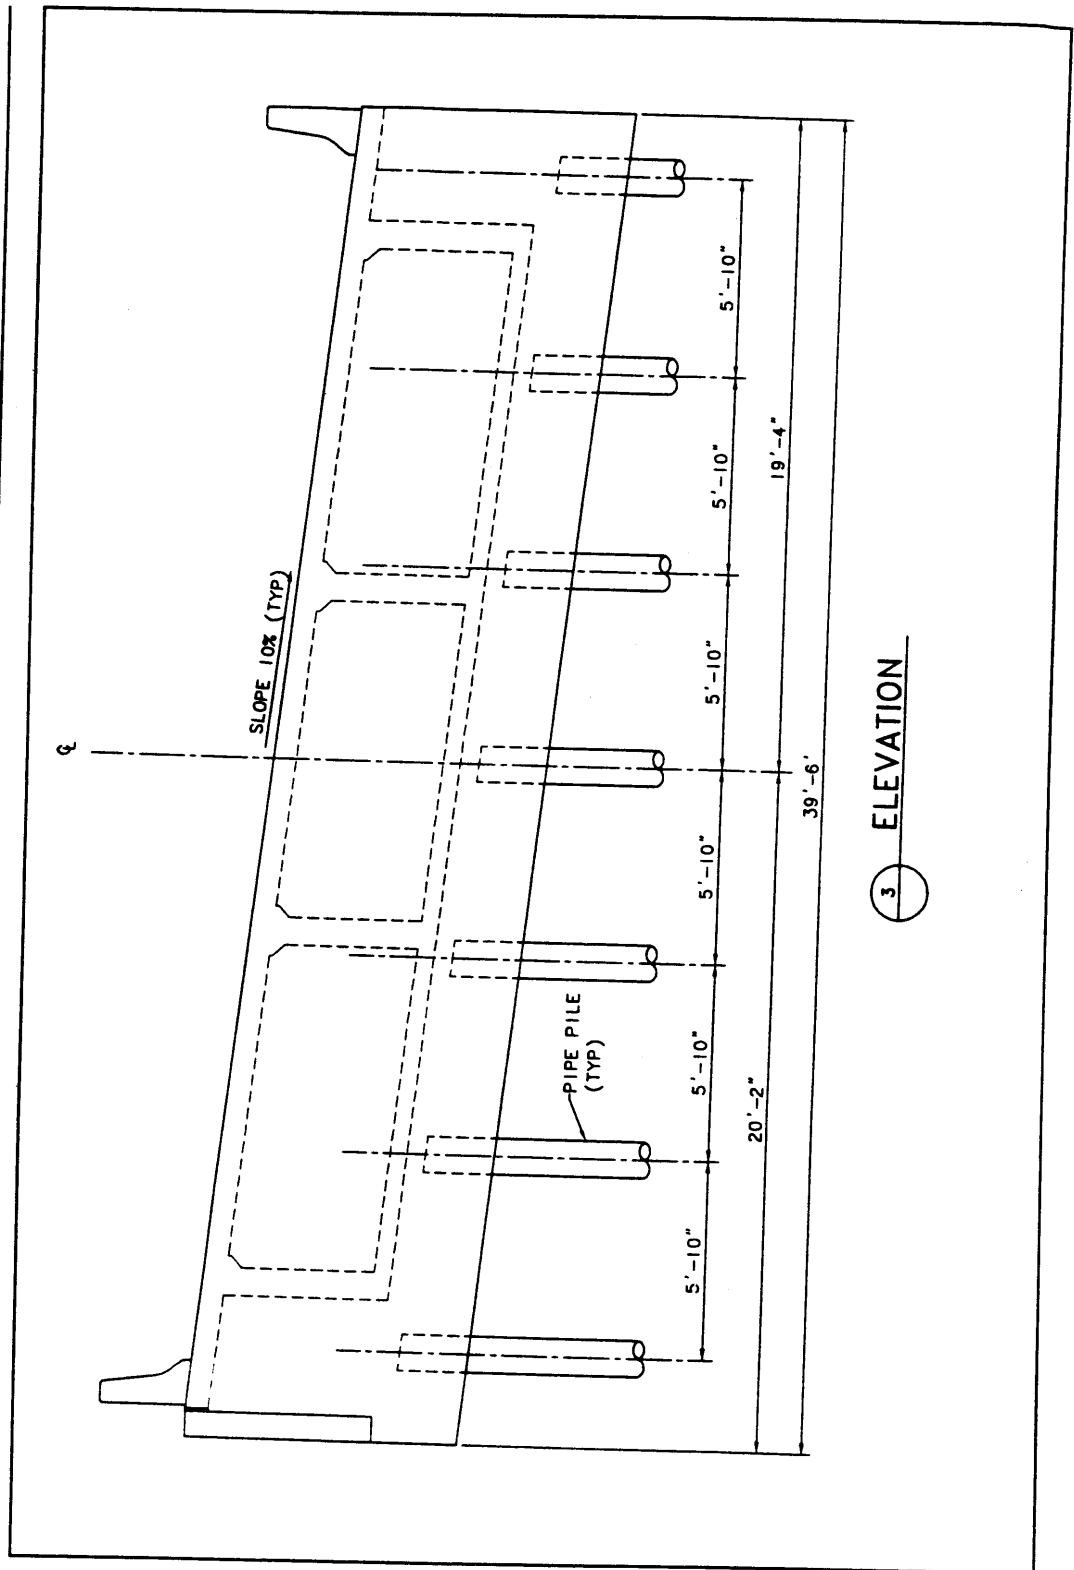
Bridge No. 6 - End Elevation at Abutment
